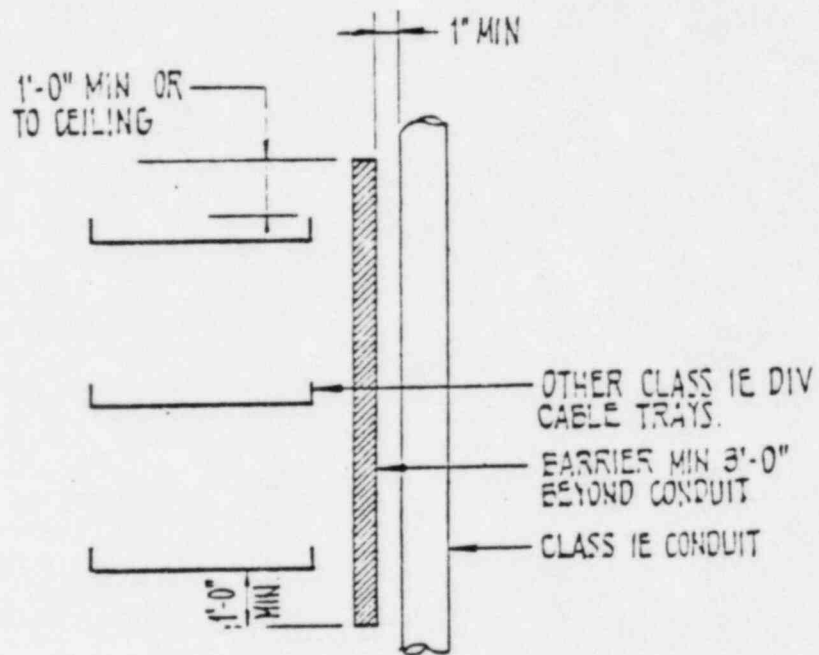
ARRANGEMENT FOR VERTICAL SAFETY CONDUITS
